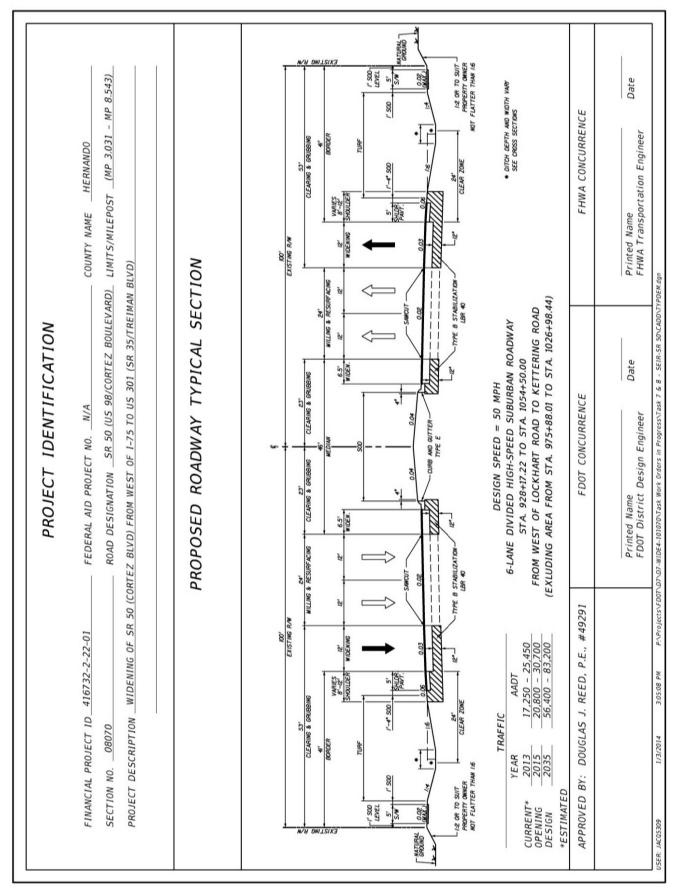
Proposed Roadway Typical Section STA. 928+17.22 to STA. 1054+50.00
